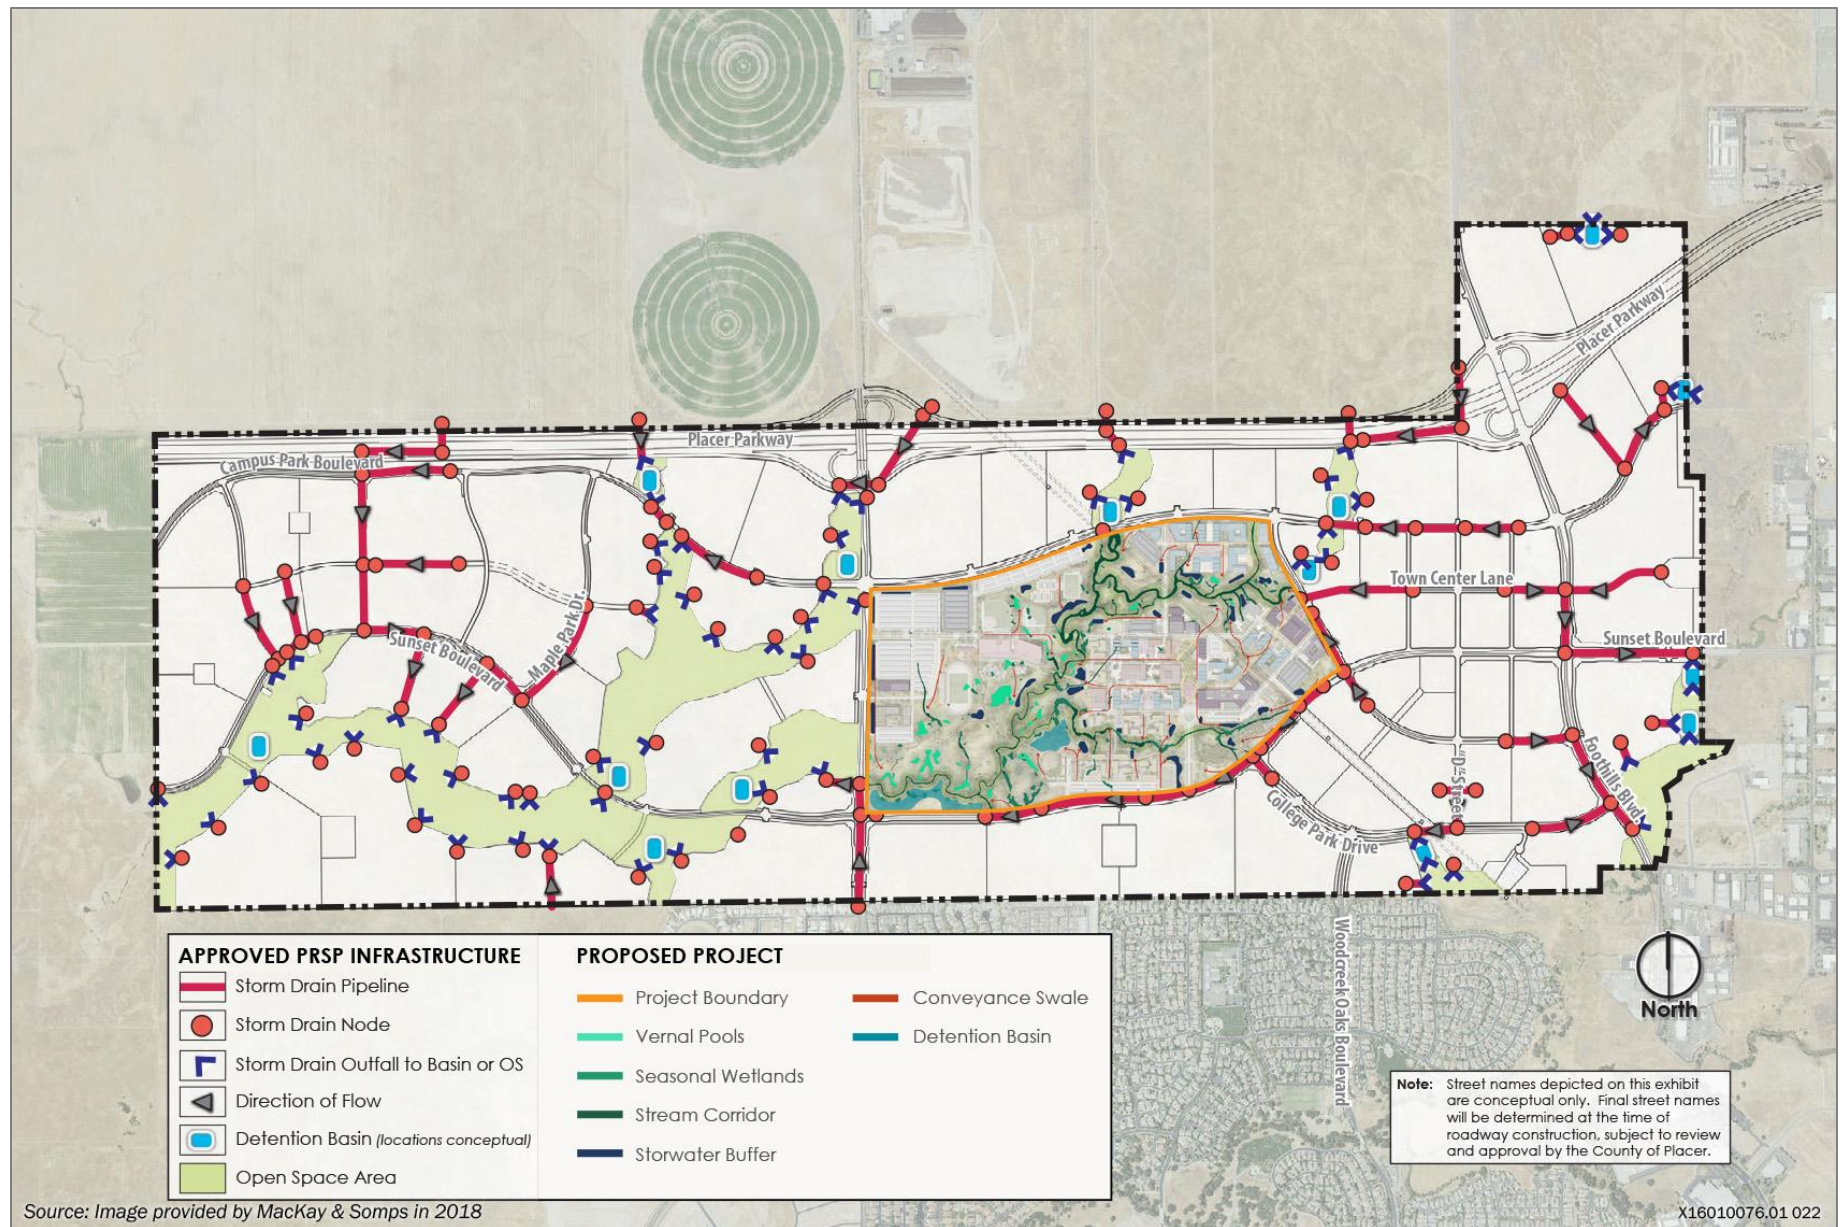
Approved Placer Ranch Specific Plan Storm Drainage Infrastructure
